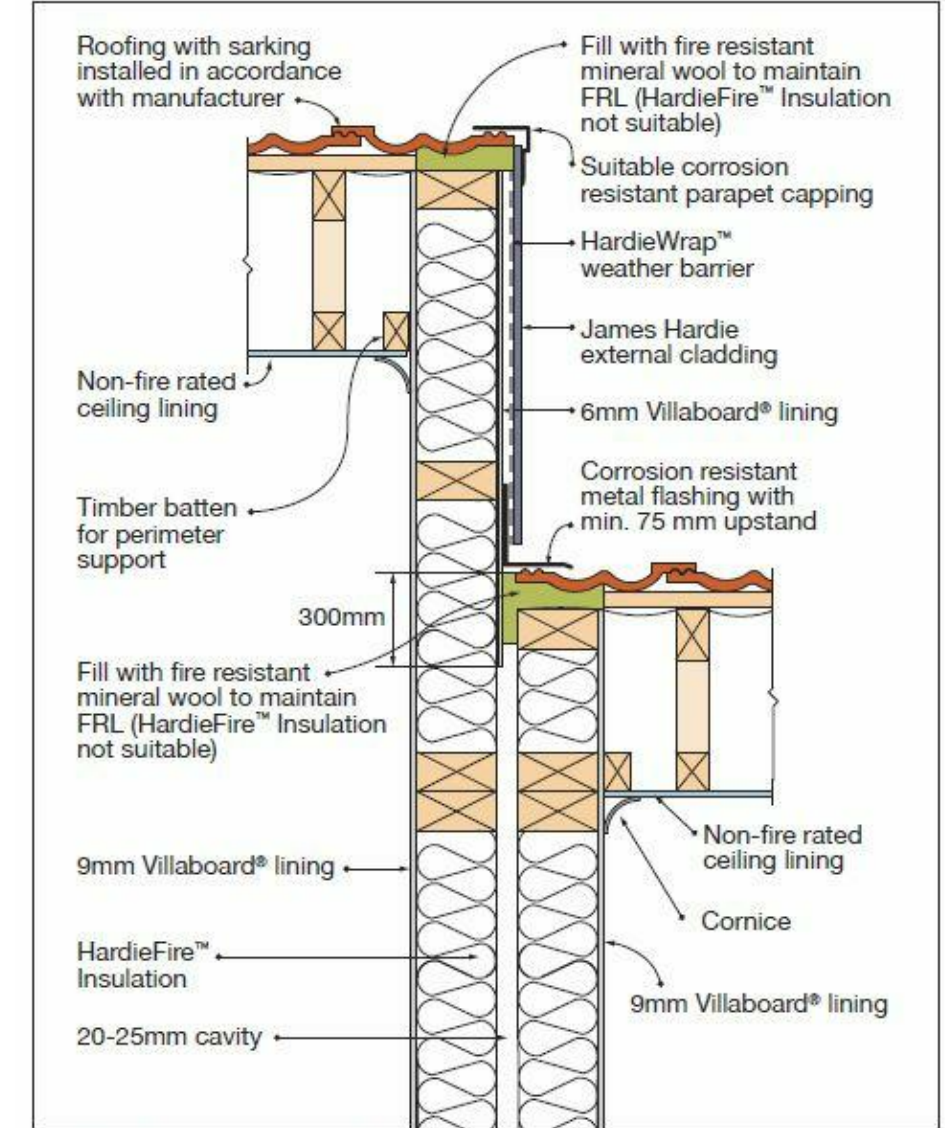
HARDIESMART™ INTERTENCY WALL SYSTEM TO HARDIESMART™ BOUNDARY WALL SYSTEM ABOVE
